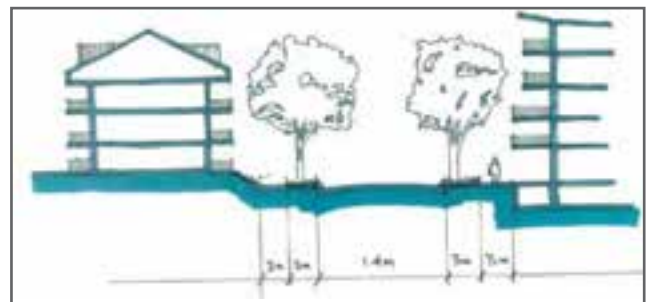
Building Type A and B building as viewed from Broughton Street
